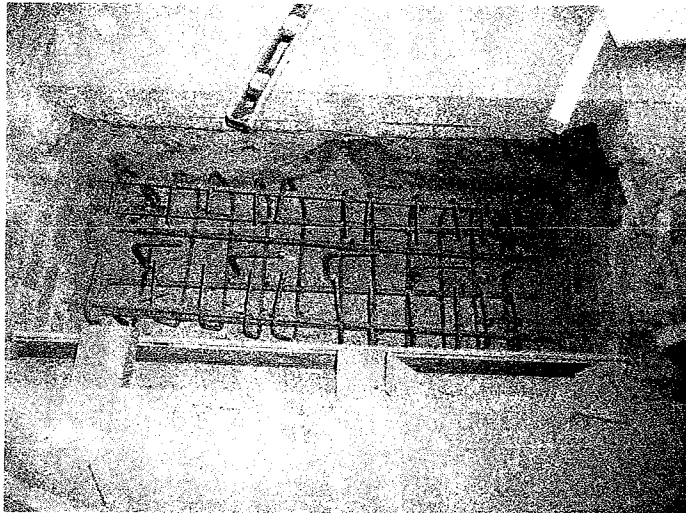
Preparation for Concrete Grade Beam at Grid A/3.7
